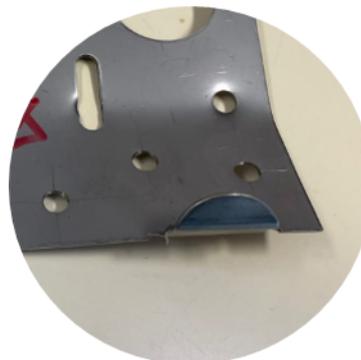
Type of CRM.03 skin element fixing rupture – horizontal load (wind)
